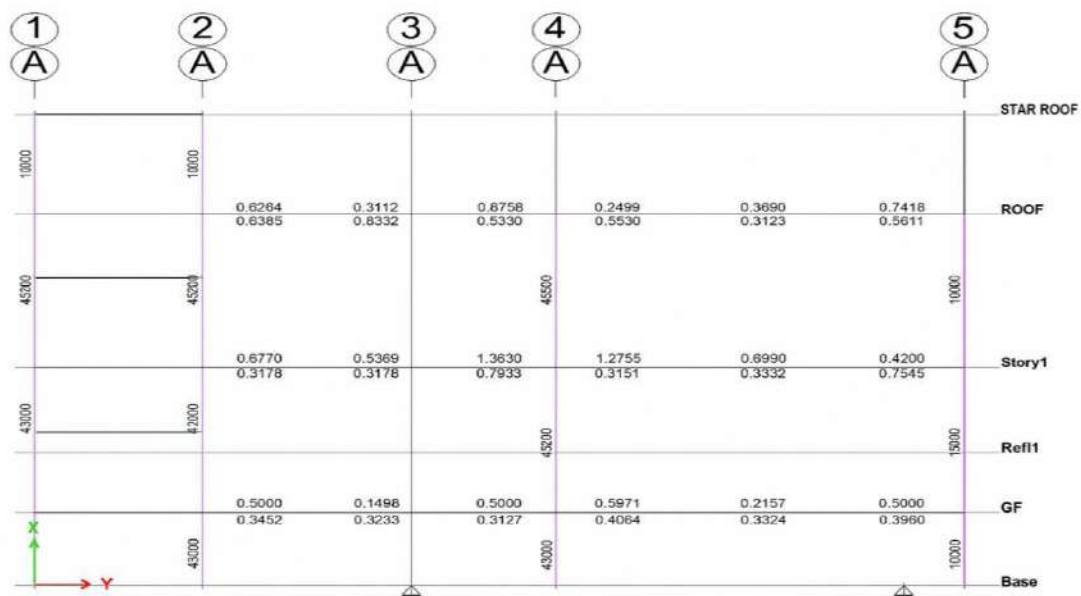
3D Dimension Beam Rebar Profile
